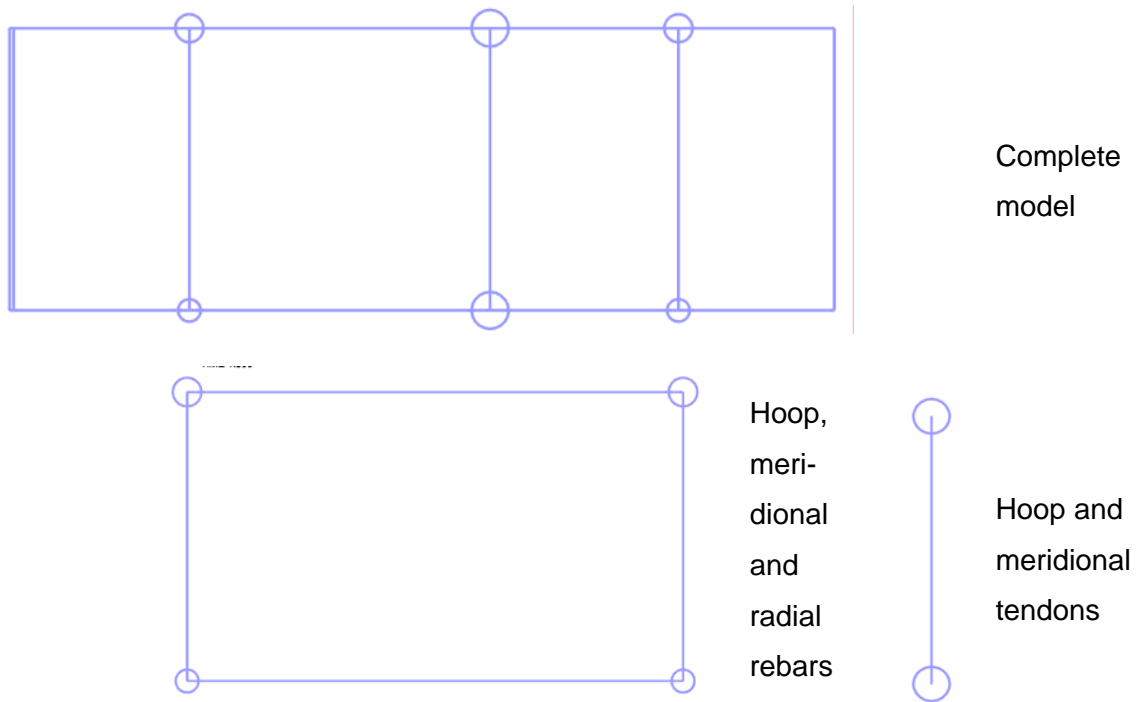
Finite element section model (slice) of prestressed concrete model containment
